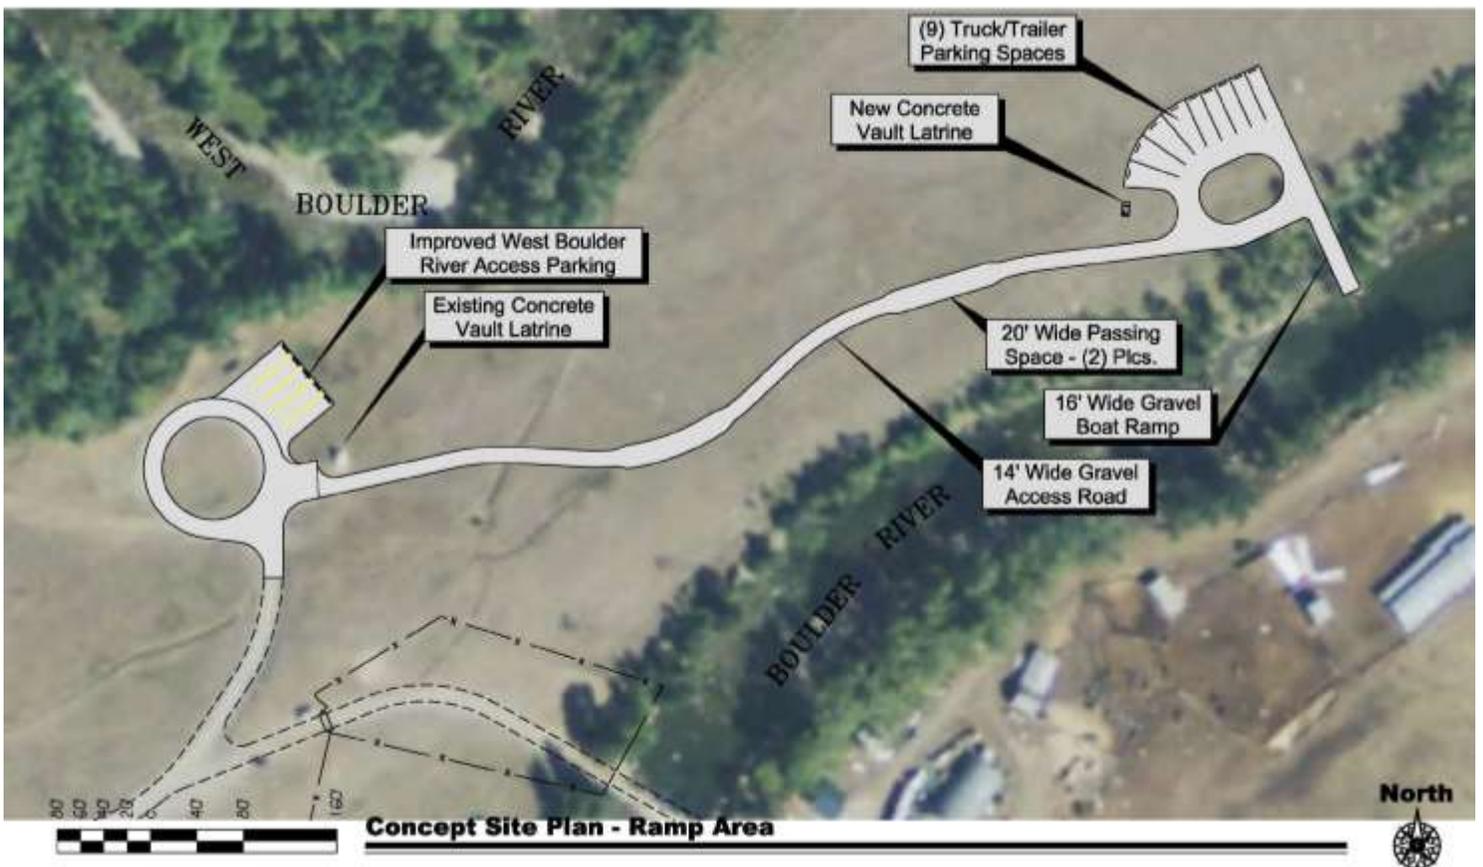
Boulder Forks FAS Preliminary Concept Site Plan
